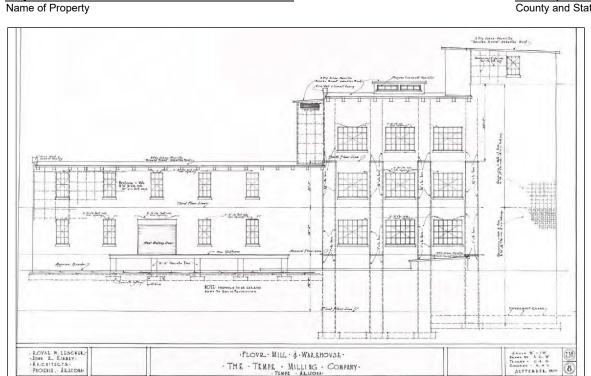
Architectural drawing of Hayen Flour Mill, 1917, east elevation (Architects Lescher & Kibbey)
